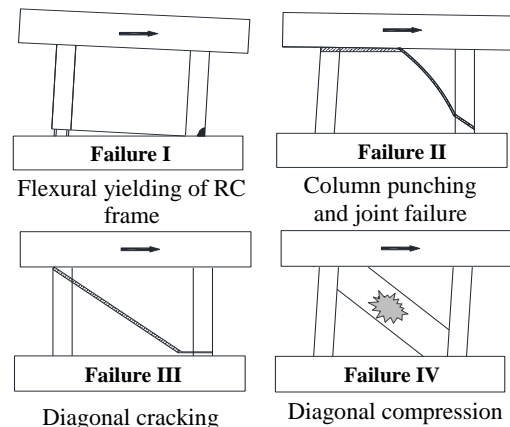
All possible failure modes of Ferro-cement laminated masonry infilled RC frame
